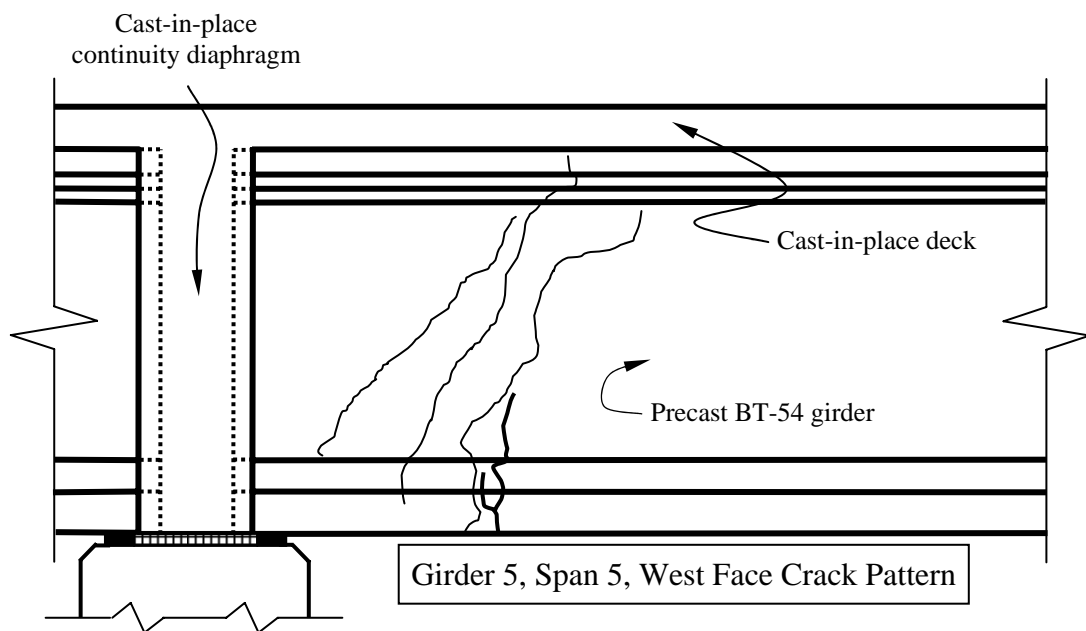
Typical Pattern of Cracking in End Region of Precast Girder (Barnes et al. 2006) Note: The bolder line on the bottom-flange cracks indicates a greater crack width.
